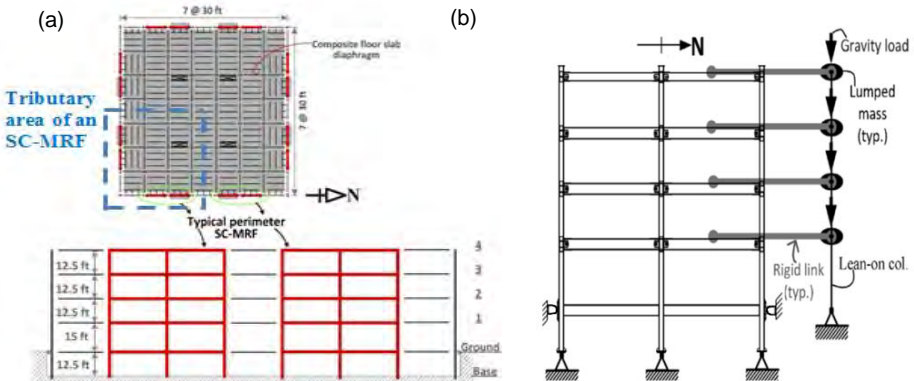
Prototype building: (a) Floor plan and elevation; (b) SC-MRF and gravity frame model
